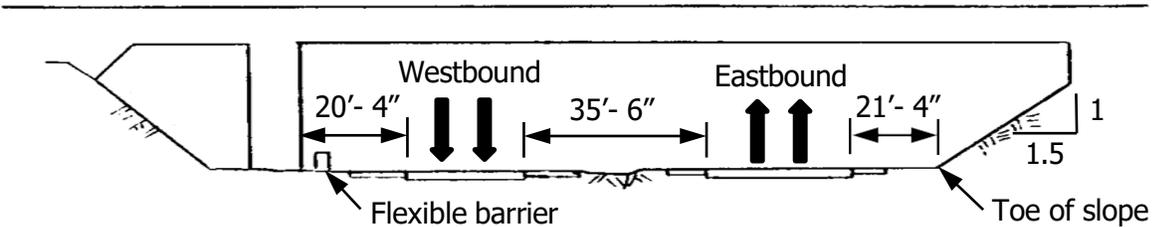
Bridge elevation view of horizontal clearances for separate westbound and eastbound highway features below the bridge, with flexible barrier.
